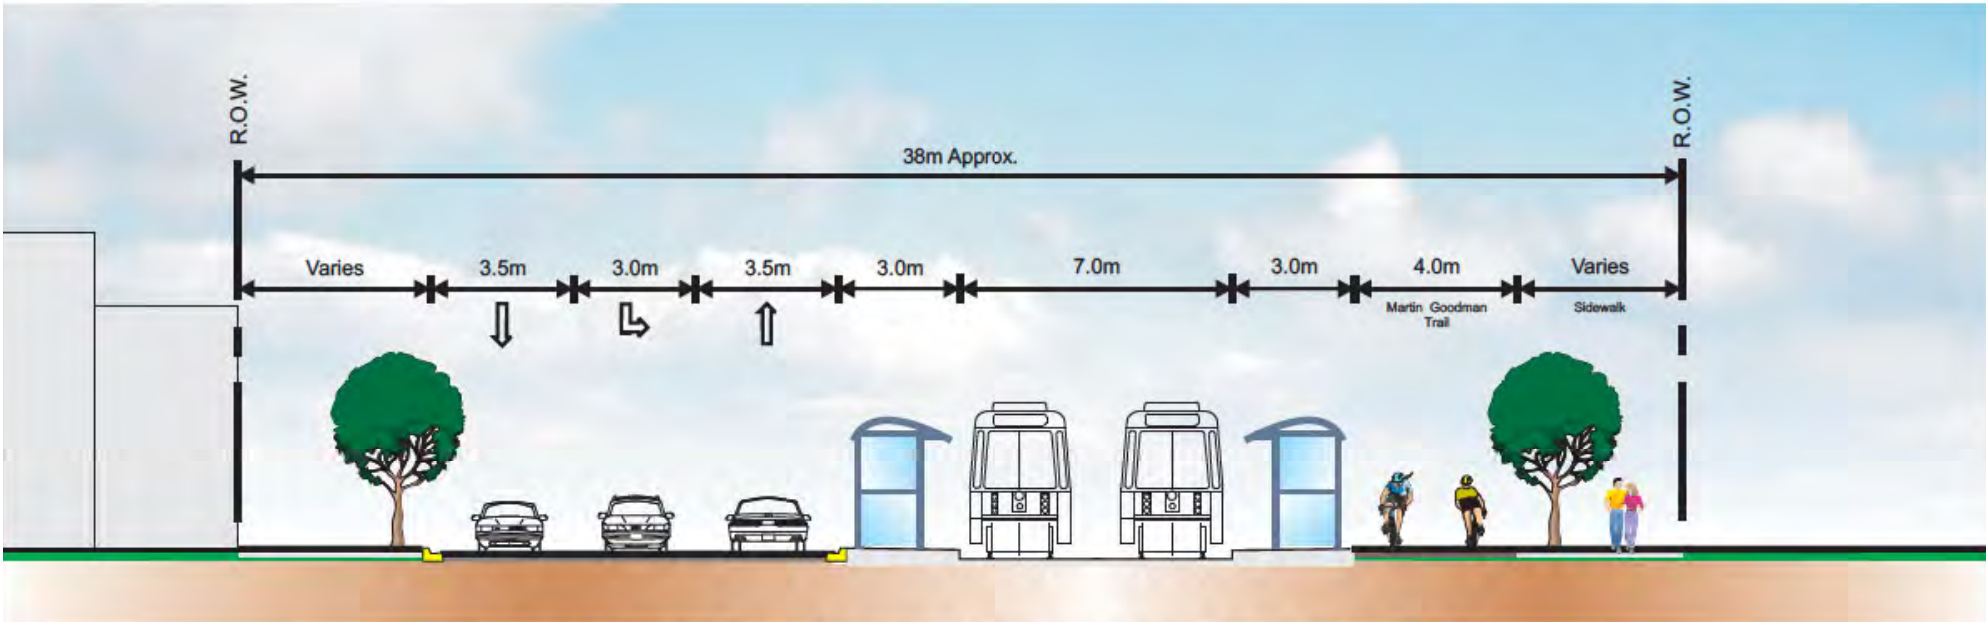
Typical cross section (2010 EBF Transit Class EA)
